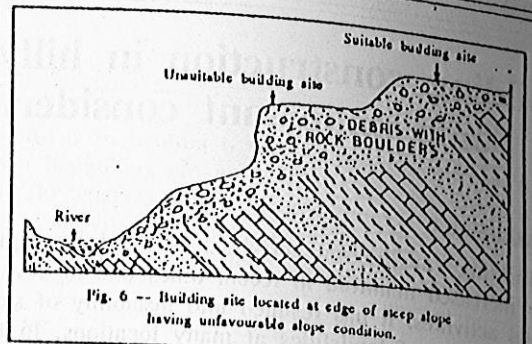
Building site located at edge of steep slope having unfavourable slope condition.
